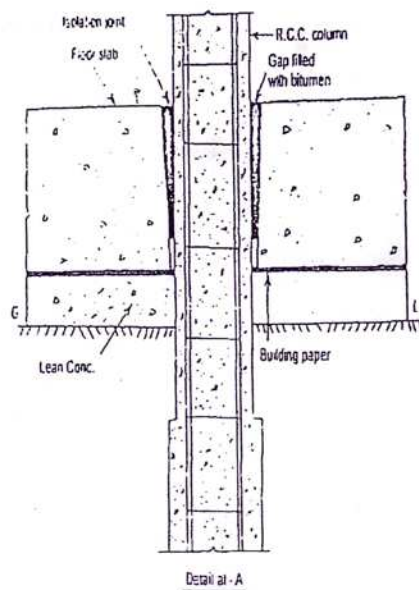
Isolation joint between R.C.C. column and floor slab.
